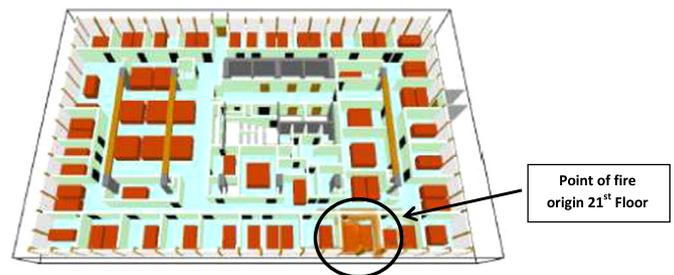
Plan of the 21st floor at the Windsor Tower showing the point of fire ignition [19].
